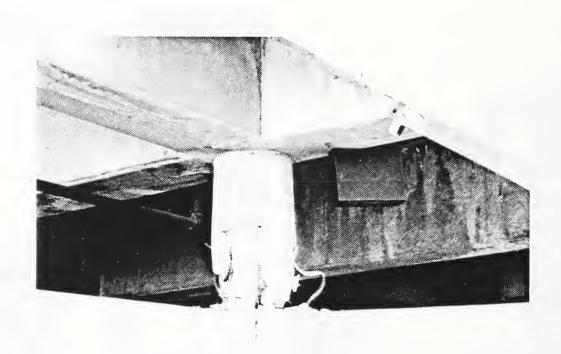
Non-ductile failure of a short column. Note fractured #2 tie and buckled vertical bars.
